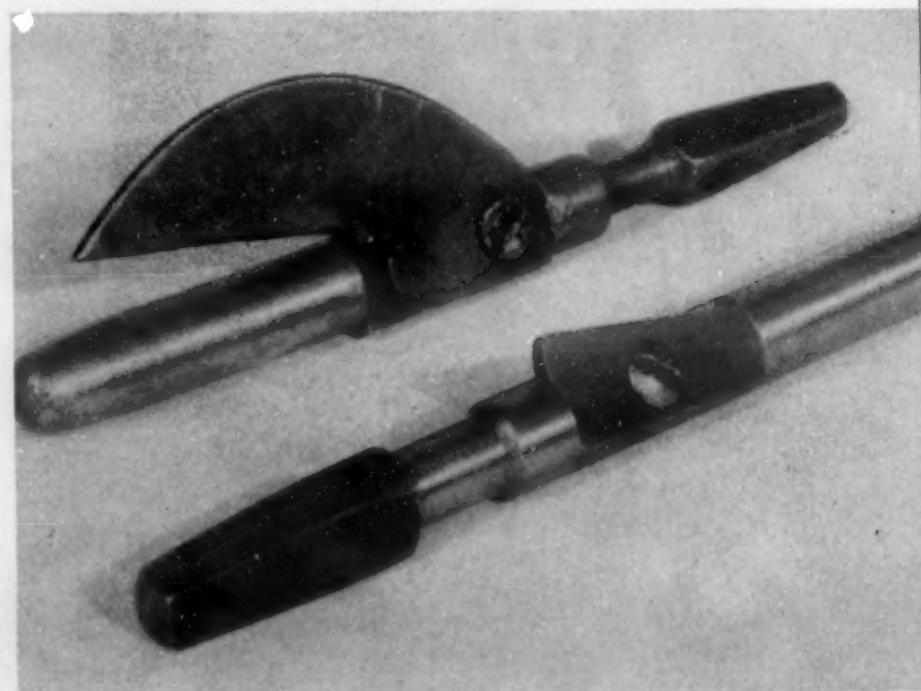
These simple tools are used to make male and female cones on lead pipe prior to joining with thin solder foil. (Courtesy: George Jennings [Lambeth] Ltd.)
